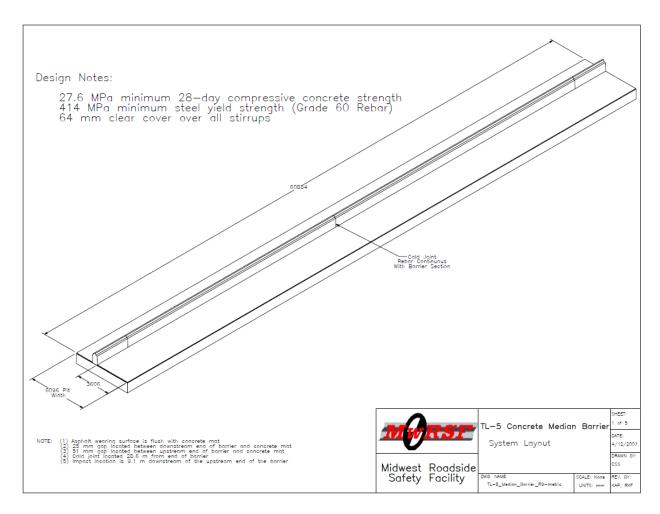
Test installation layout, Test No. TL5CMB-2, reprinted from [16]
